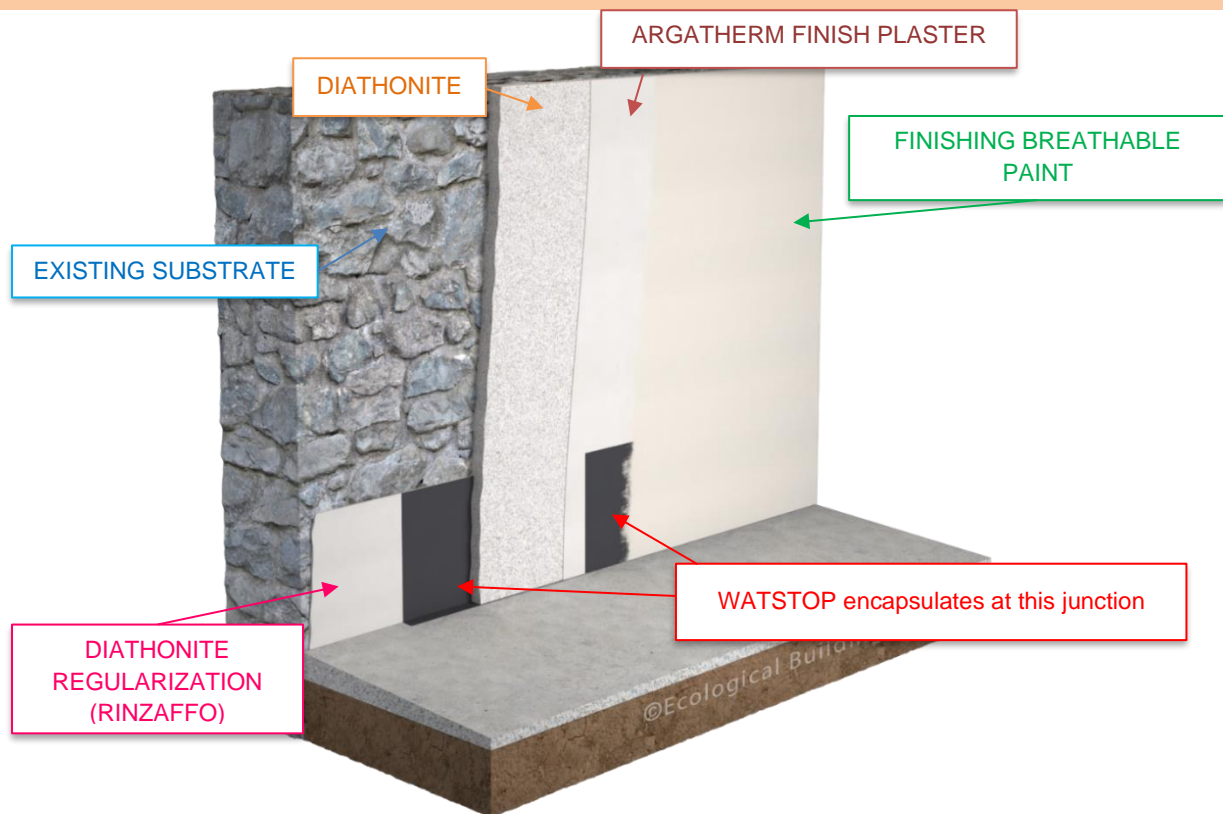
Application of WATstop between the wall and hard external flooring to prevent water ingress. Robust detailing at ground level with adequate drainage and maintenance of water goods.
